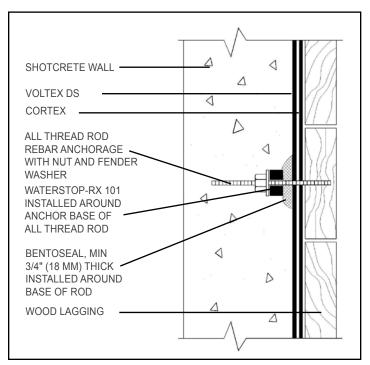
A: REBAR ANCHORAGE (ALL THREAD)
